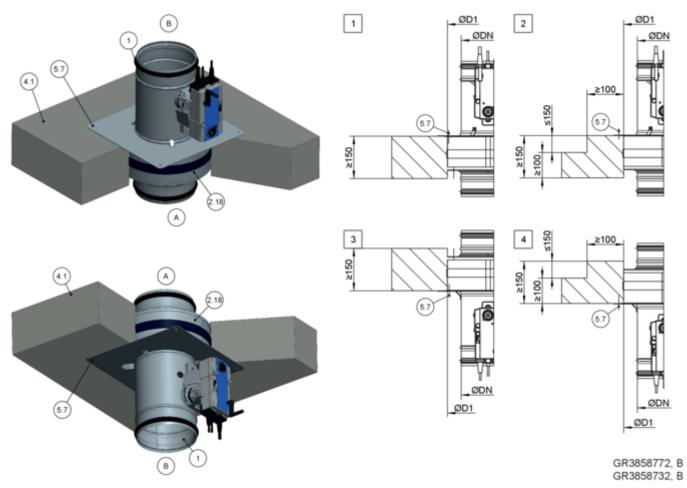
Dry mortarless installation with installation block ER in solid ceiling slab, upright and suspended
